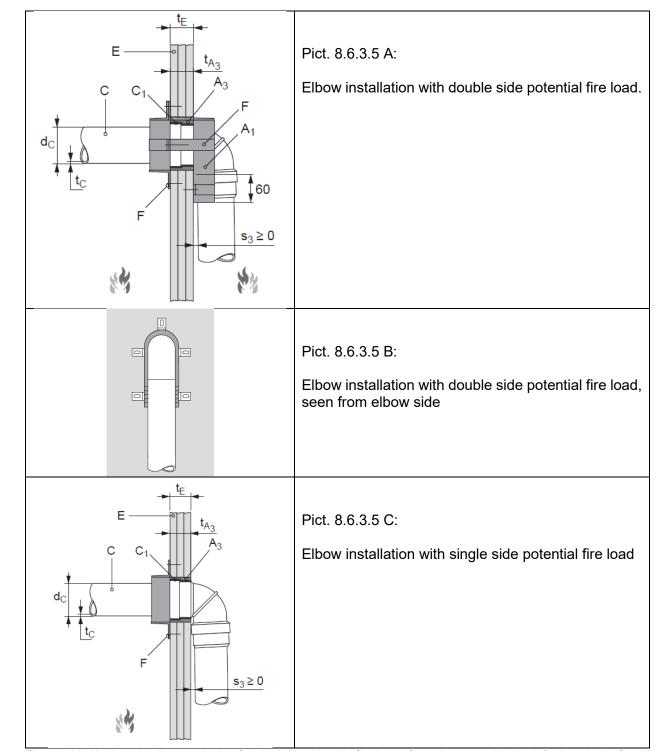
Hook and collar positioning for single/double side fire load of plastic pipes with 2 x 45° elbow in shaft wall system B
